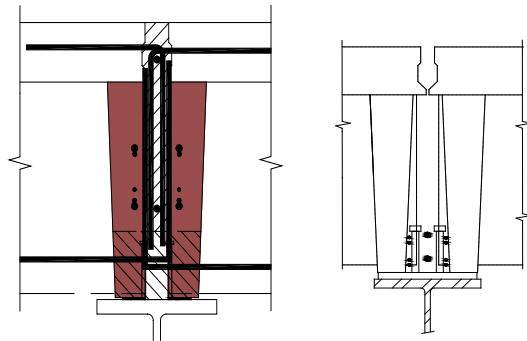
Composite Action between the Precast Deck and the Through Truss Floor Beams
